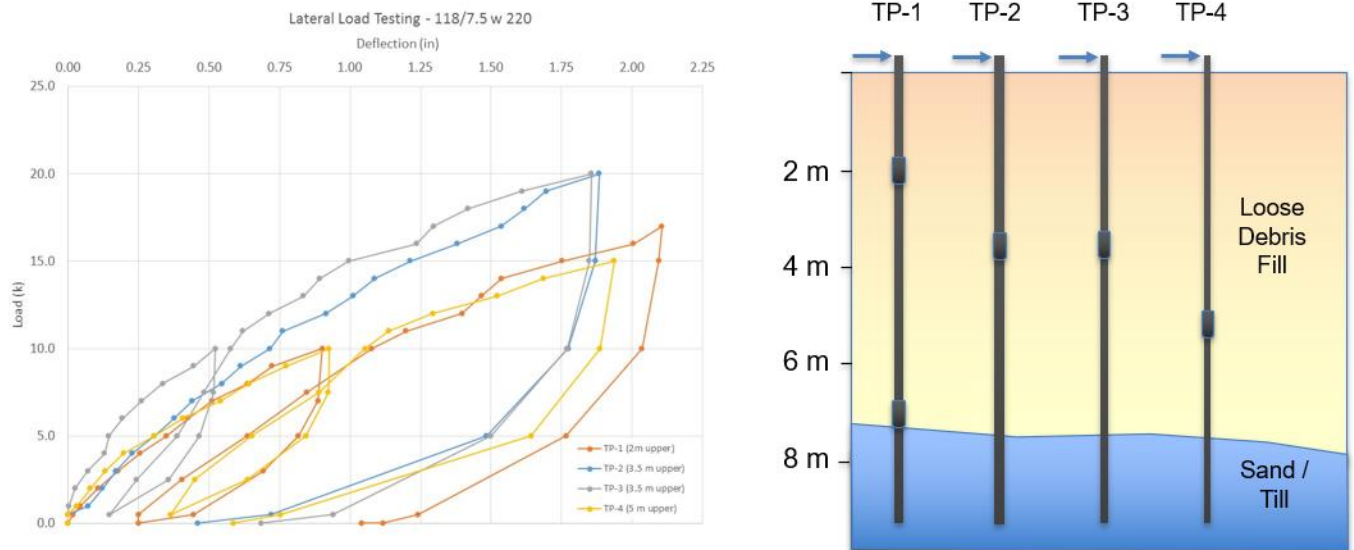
Full-scale Lateral Load Test Results on Series 118/7.5 with 220 mm Grout Shoe
